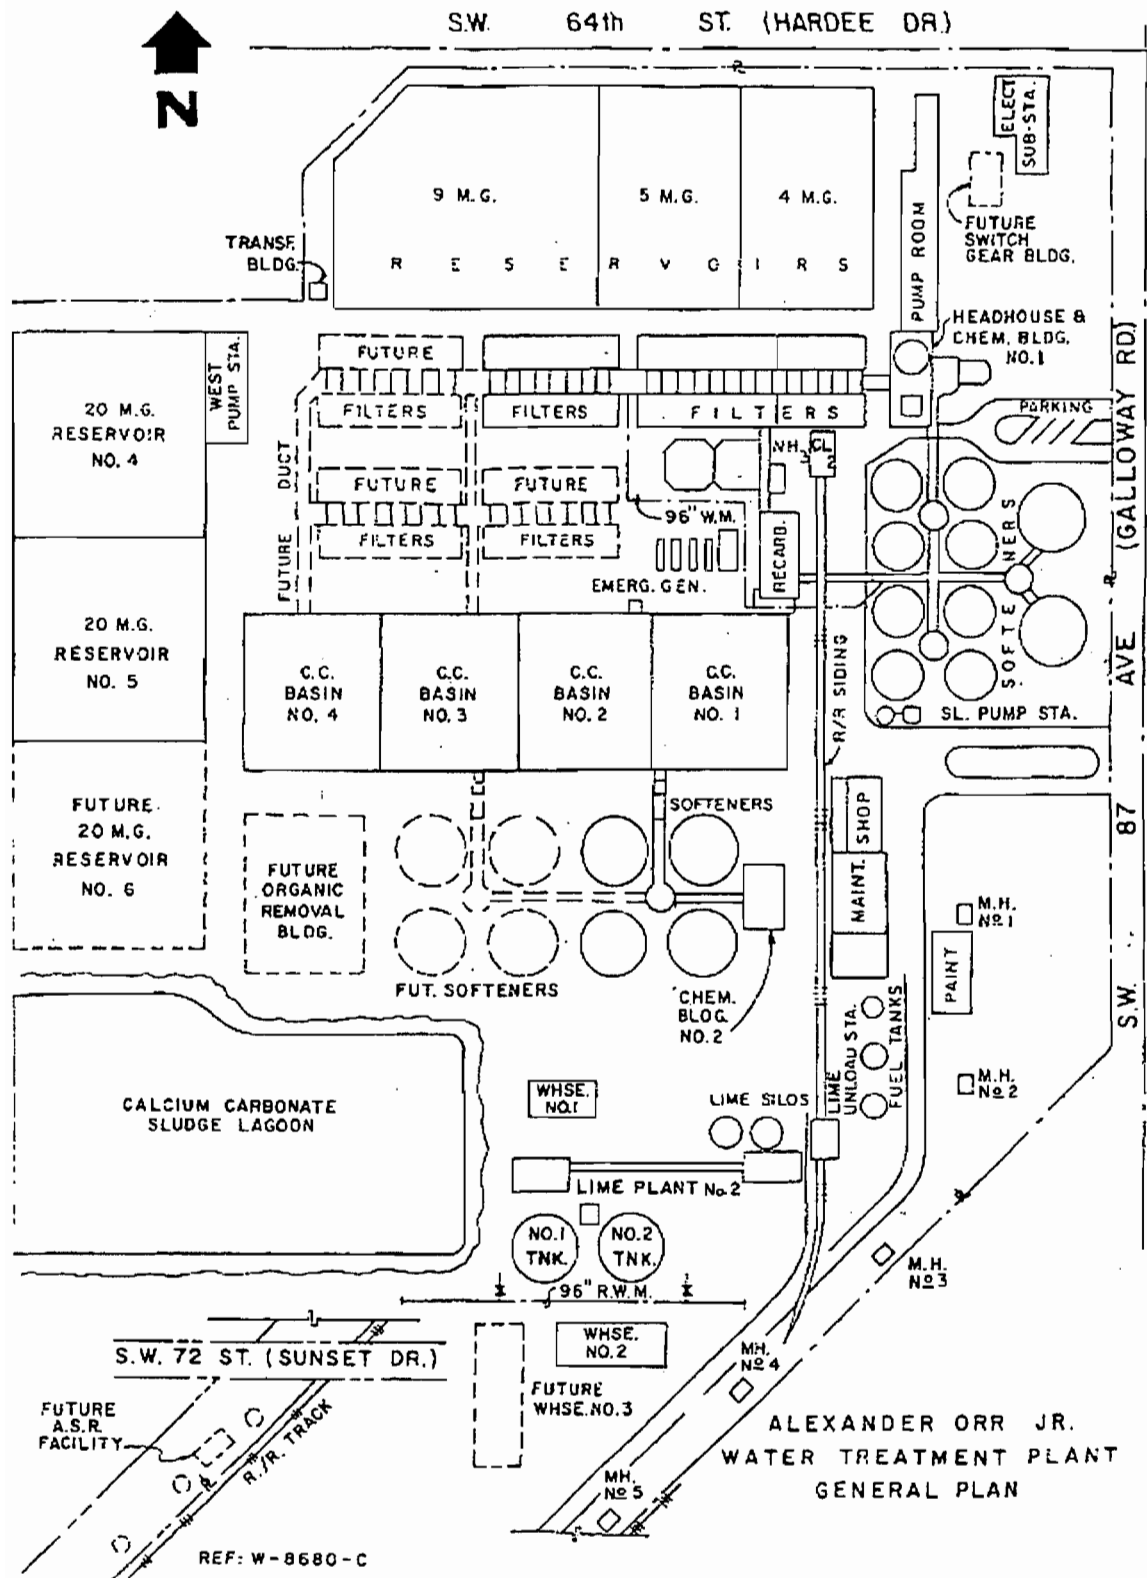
Alexander Orr, Jr. Water Treatment Plant Layout
